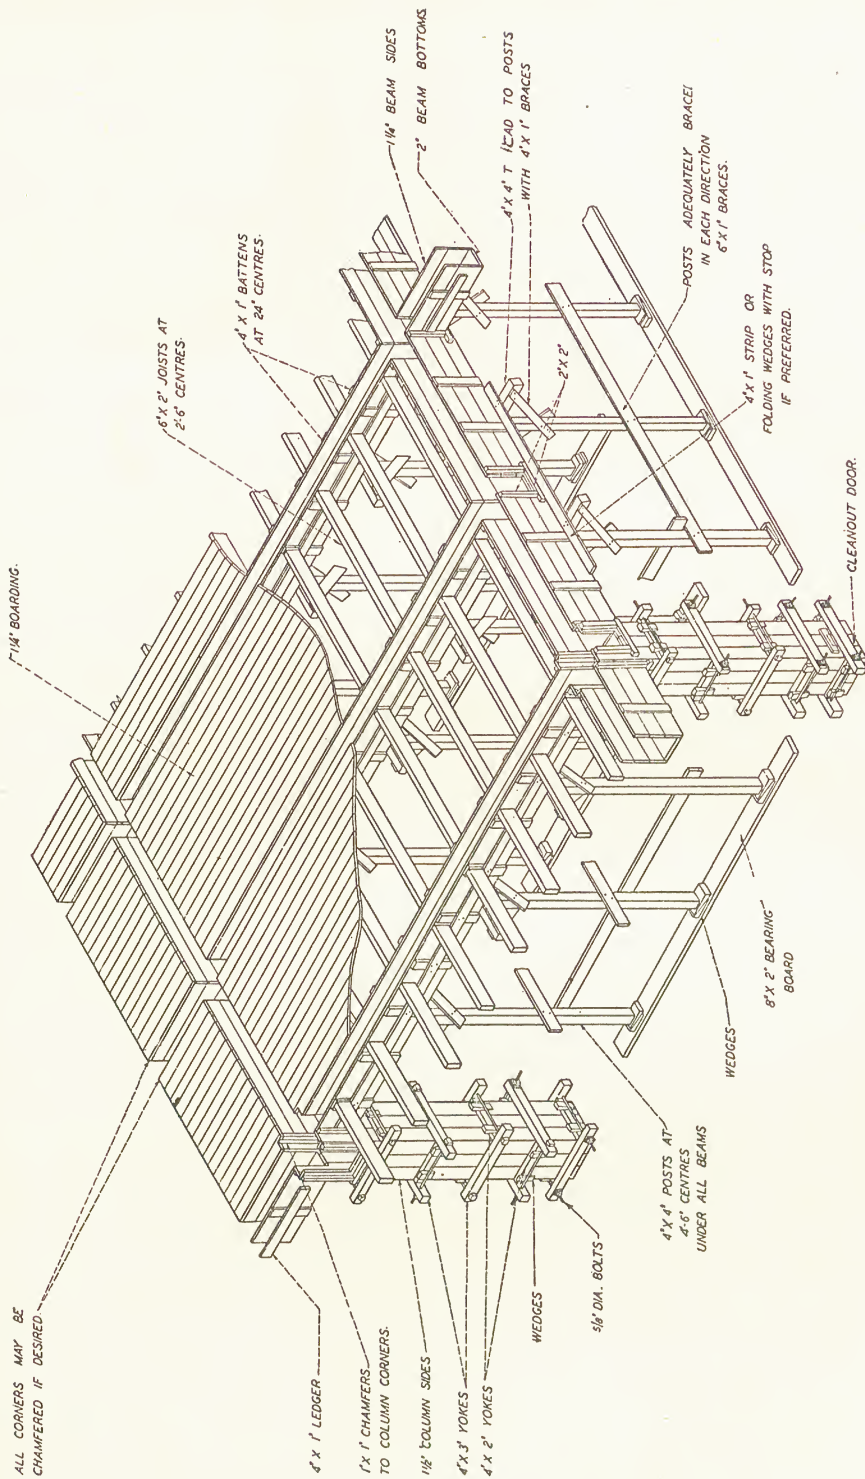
Formwork for reinforced concrete columns, beams, and floors—a typical example.
